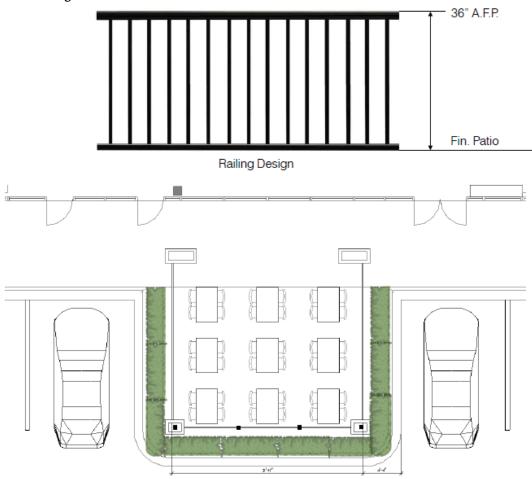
demonstrates the appearance and locations of fencing around the outdoor seating area. The fence does not appear to be in conflict with PVZDR Section Q.5.a.
